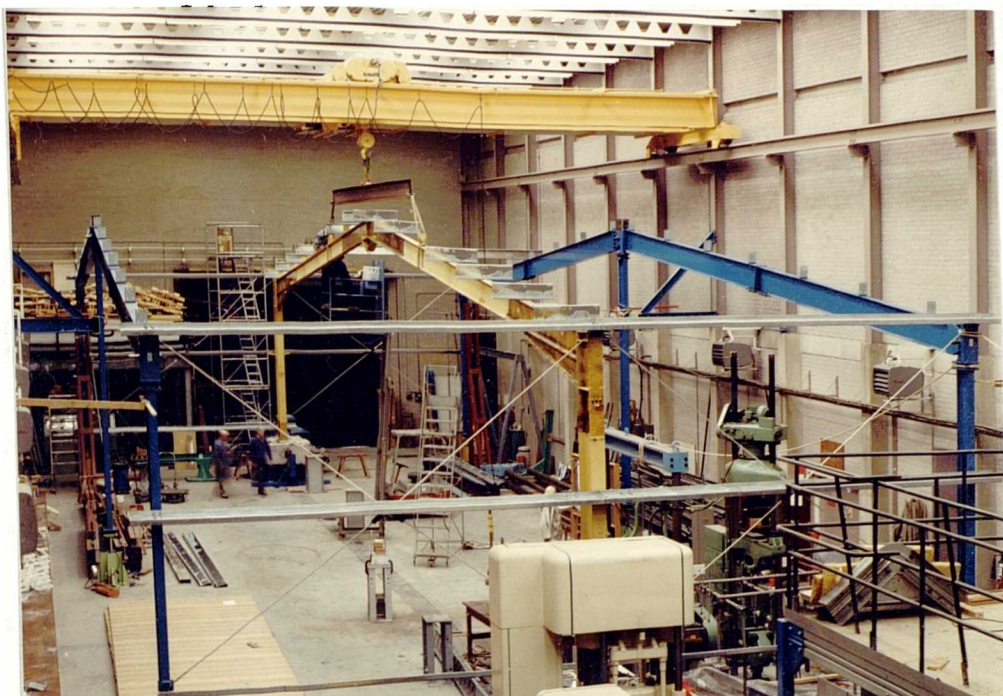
Assembly of the Test Frame Prior to Sheeting
